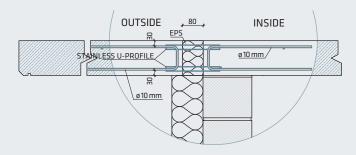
Cantilevered balcony slab with TKM G-G rib
